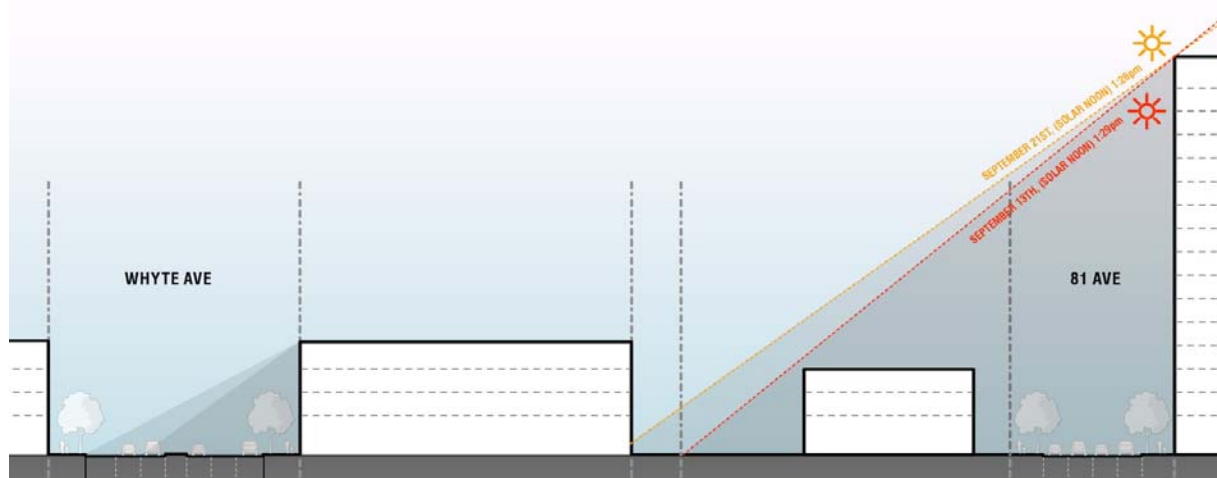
Whyte Avenue shadow with 56.0 m building height on north side of 81 Avenue
